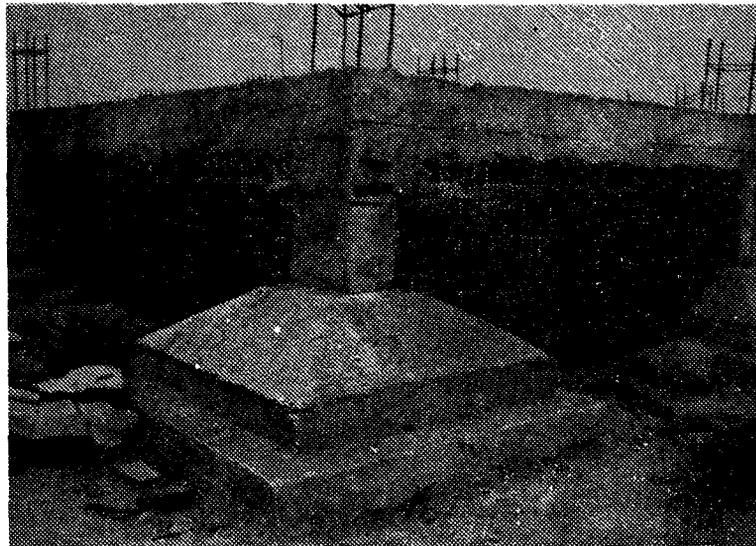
PLINTH BEAM AFTER REMOVAL OF SIDE SHUTTERING
